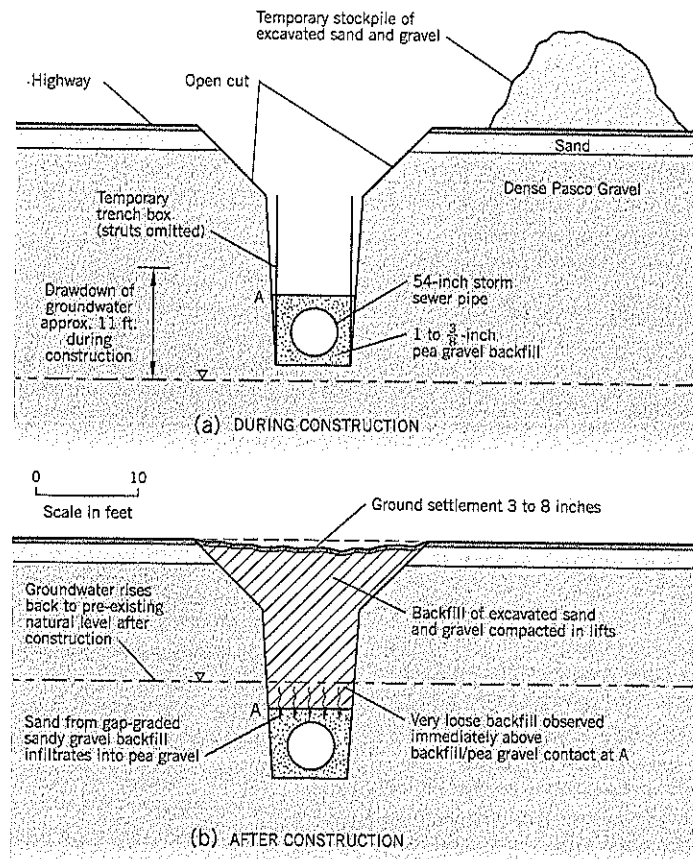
Trench excavation and backfill at Richland, Washington.
